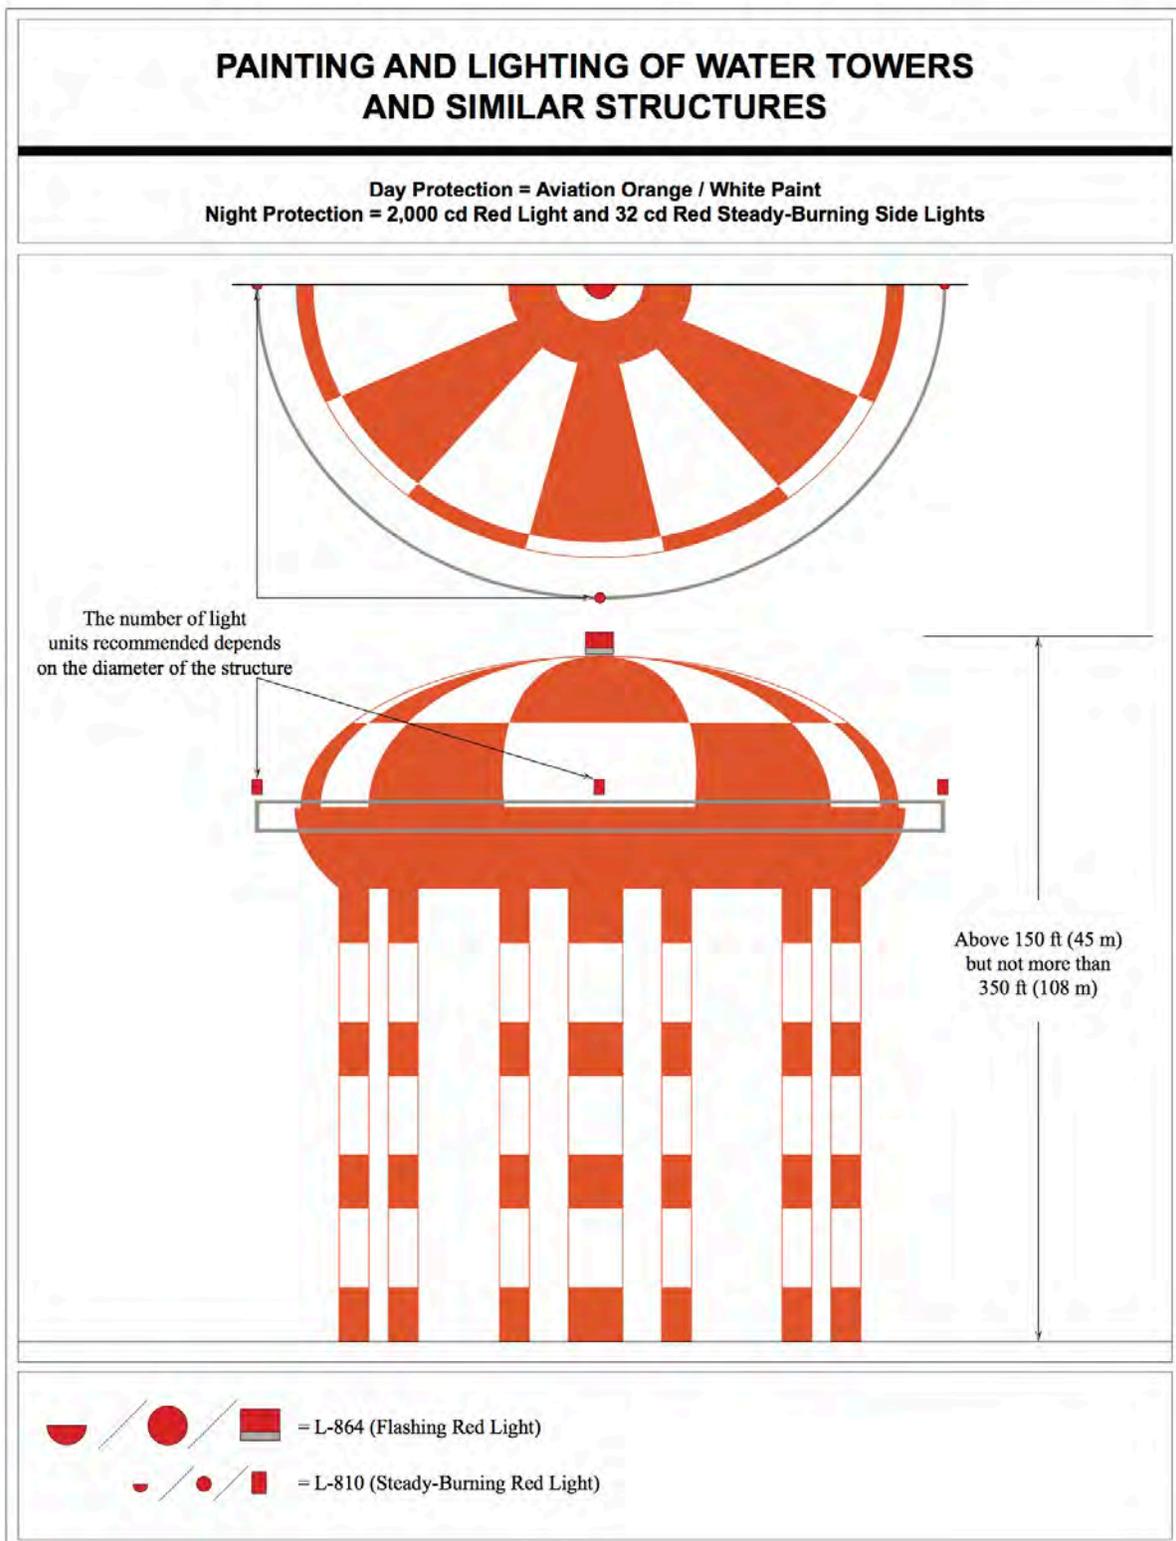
Painting and Lighting of Water Towers and Similar Structures
